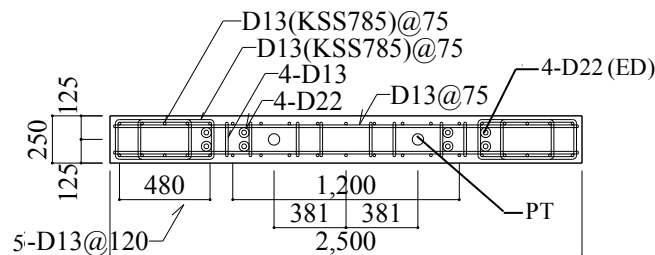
UPT wall cross section of 1st story precast wall panel (dimensions in mm)
